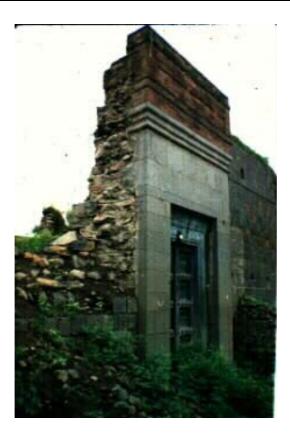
Traditional walls with random rubble masonry in mud mortar are poorly bonded
